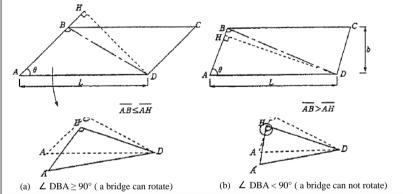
Conditions in Which a Skew Bridge can Rotate Without Being Affected by Adjoining Girders or Abutment
